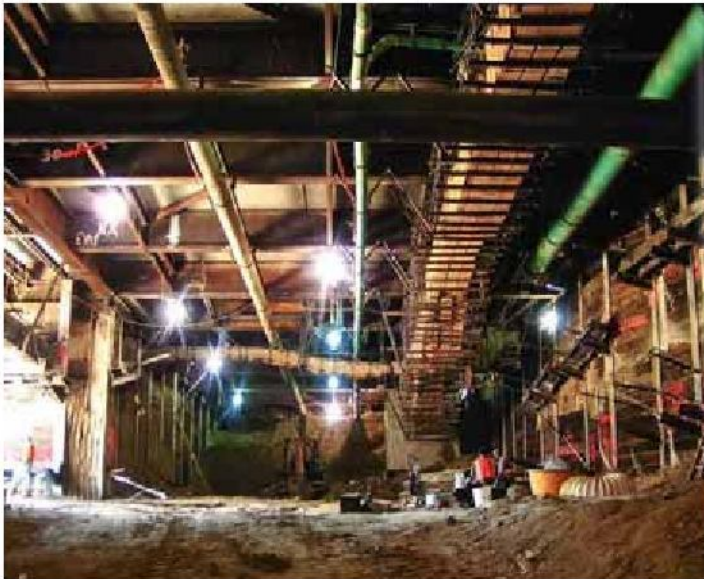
Utilities Hung from Deck Beams (Close Up)
